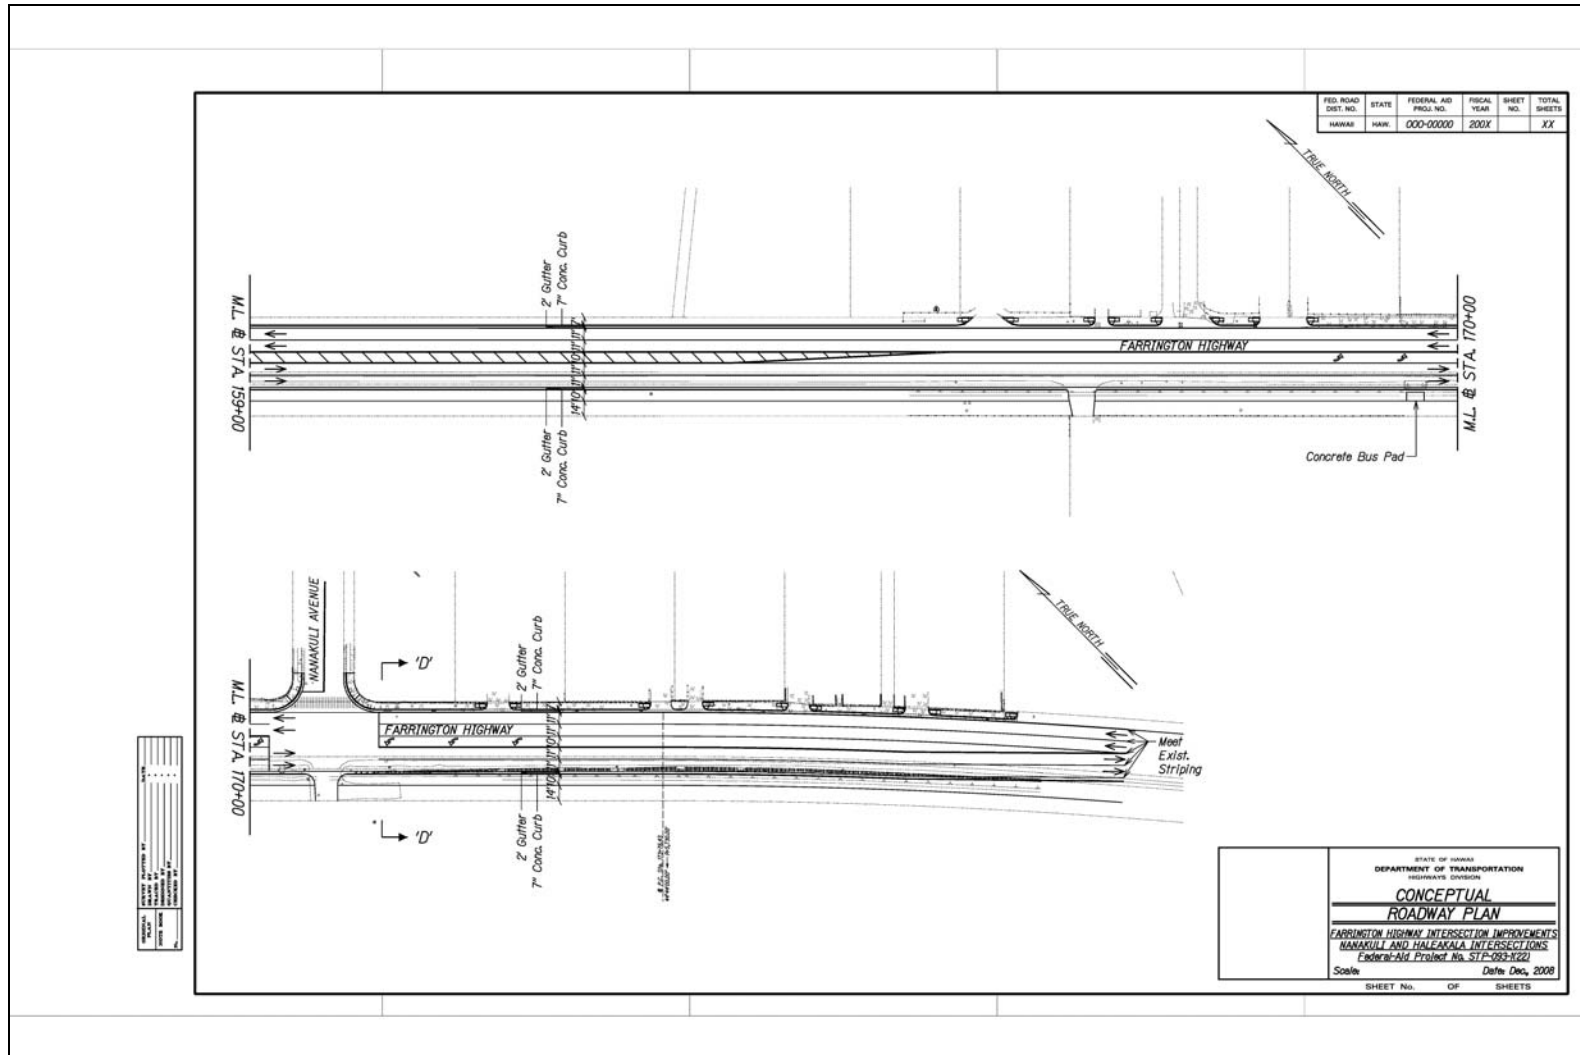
Conceptual Roadway Plan, south portion, showing vicinity of Farrington Highway and Nānākuli Avenue (HDOT 2008)
